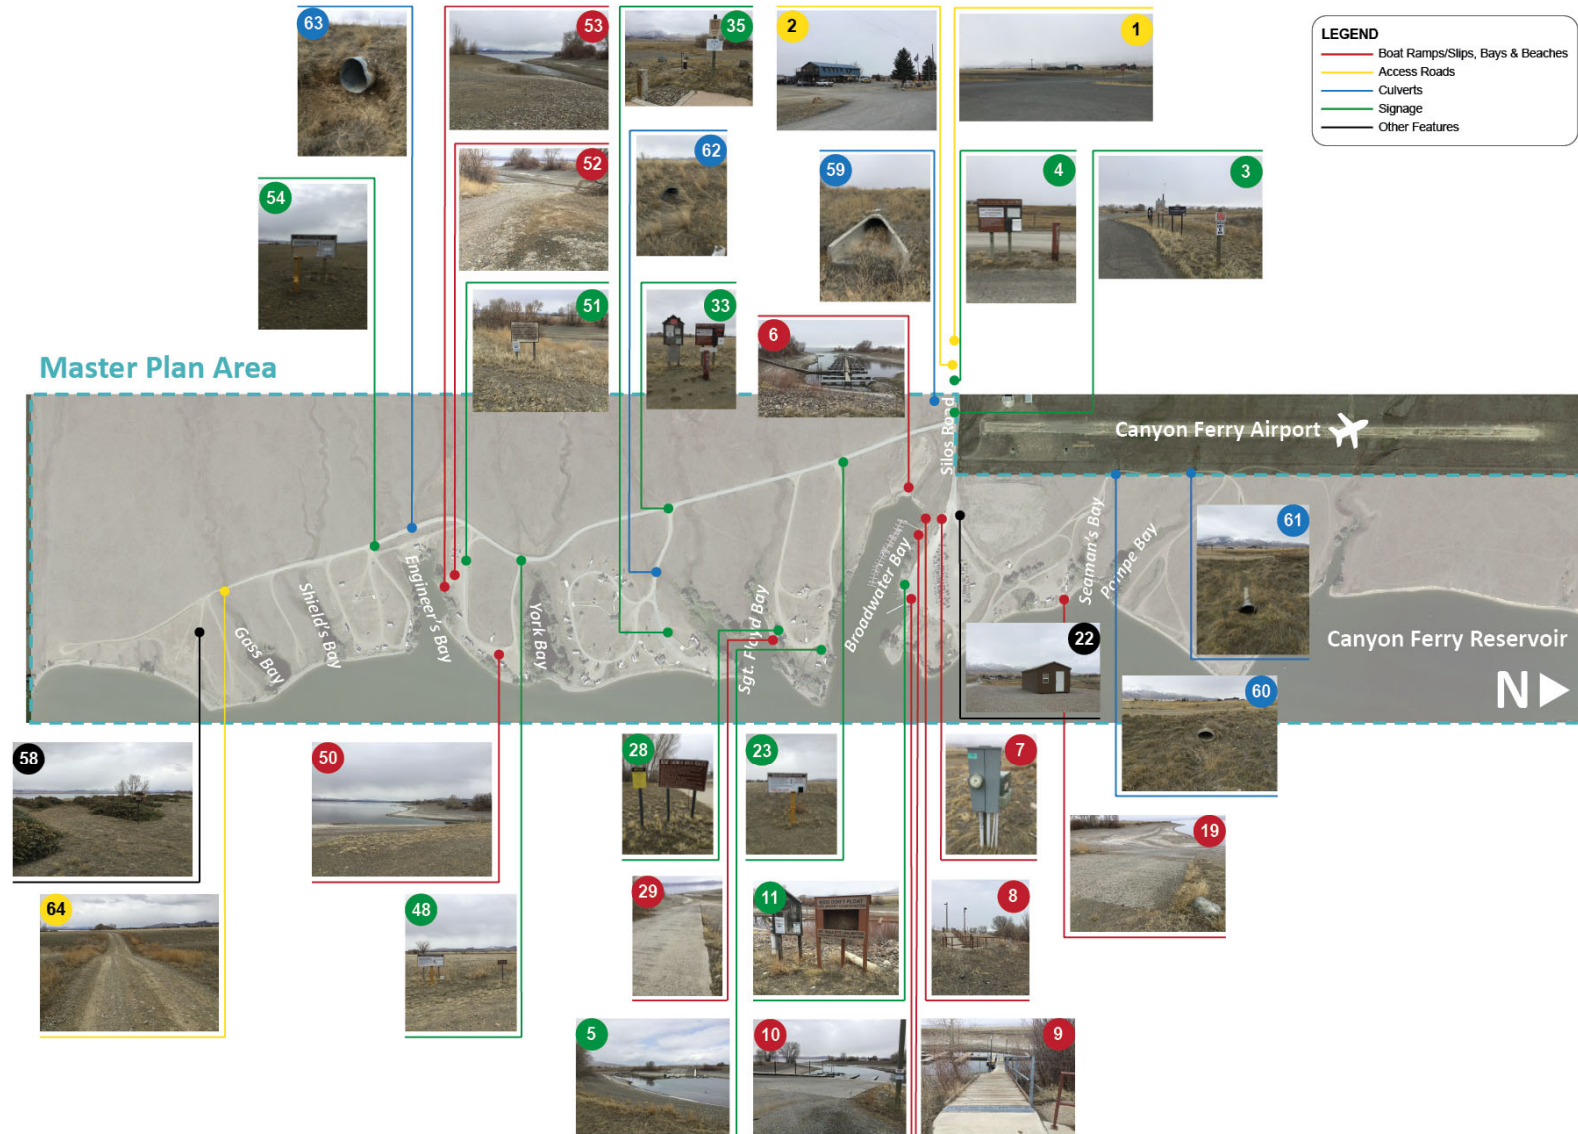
Photo Locations of Boat Ramps/Slips/Bays/Beaches, Access Roads, Culverts, Signage, Other Features
